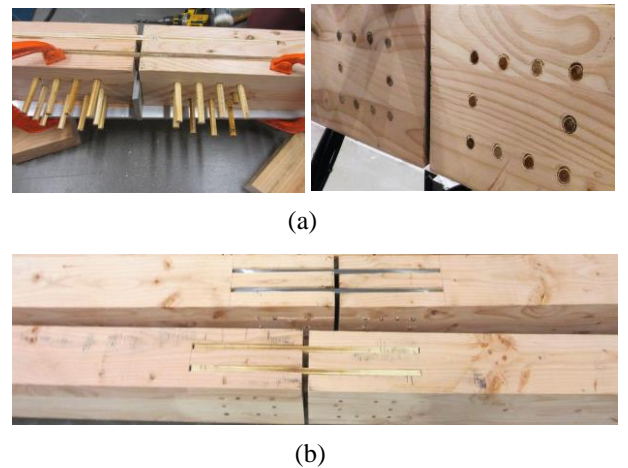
Spliced connection system, (a) fabrication process, (b) plan view of steel and compressed wood connection system.
